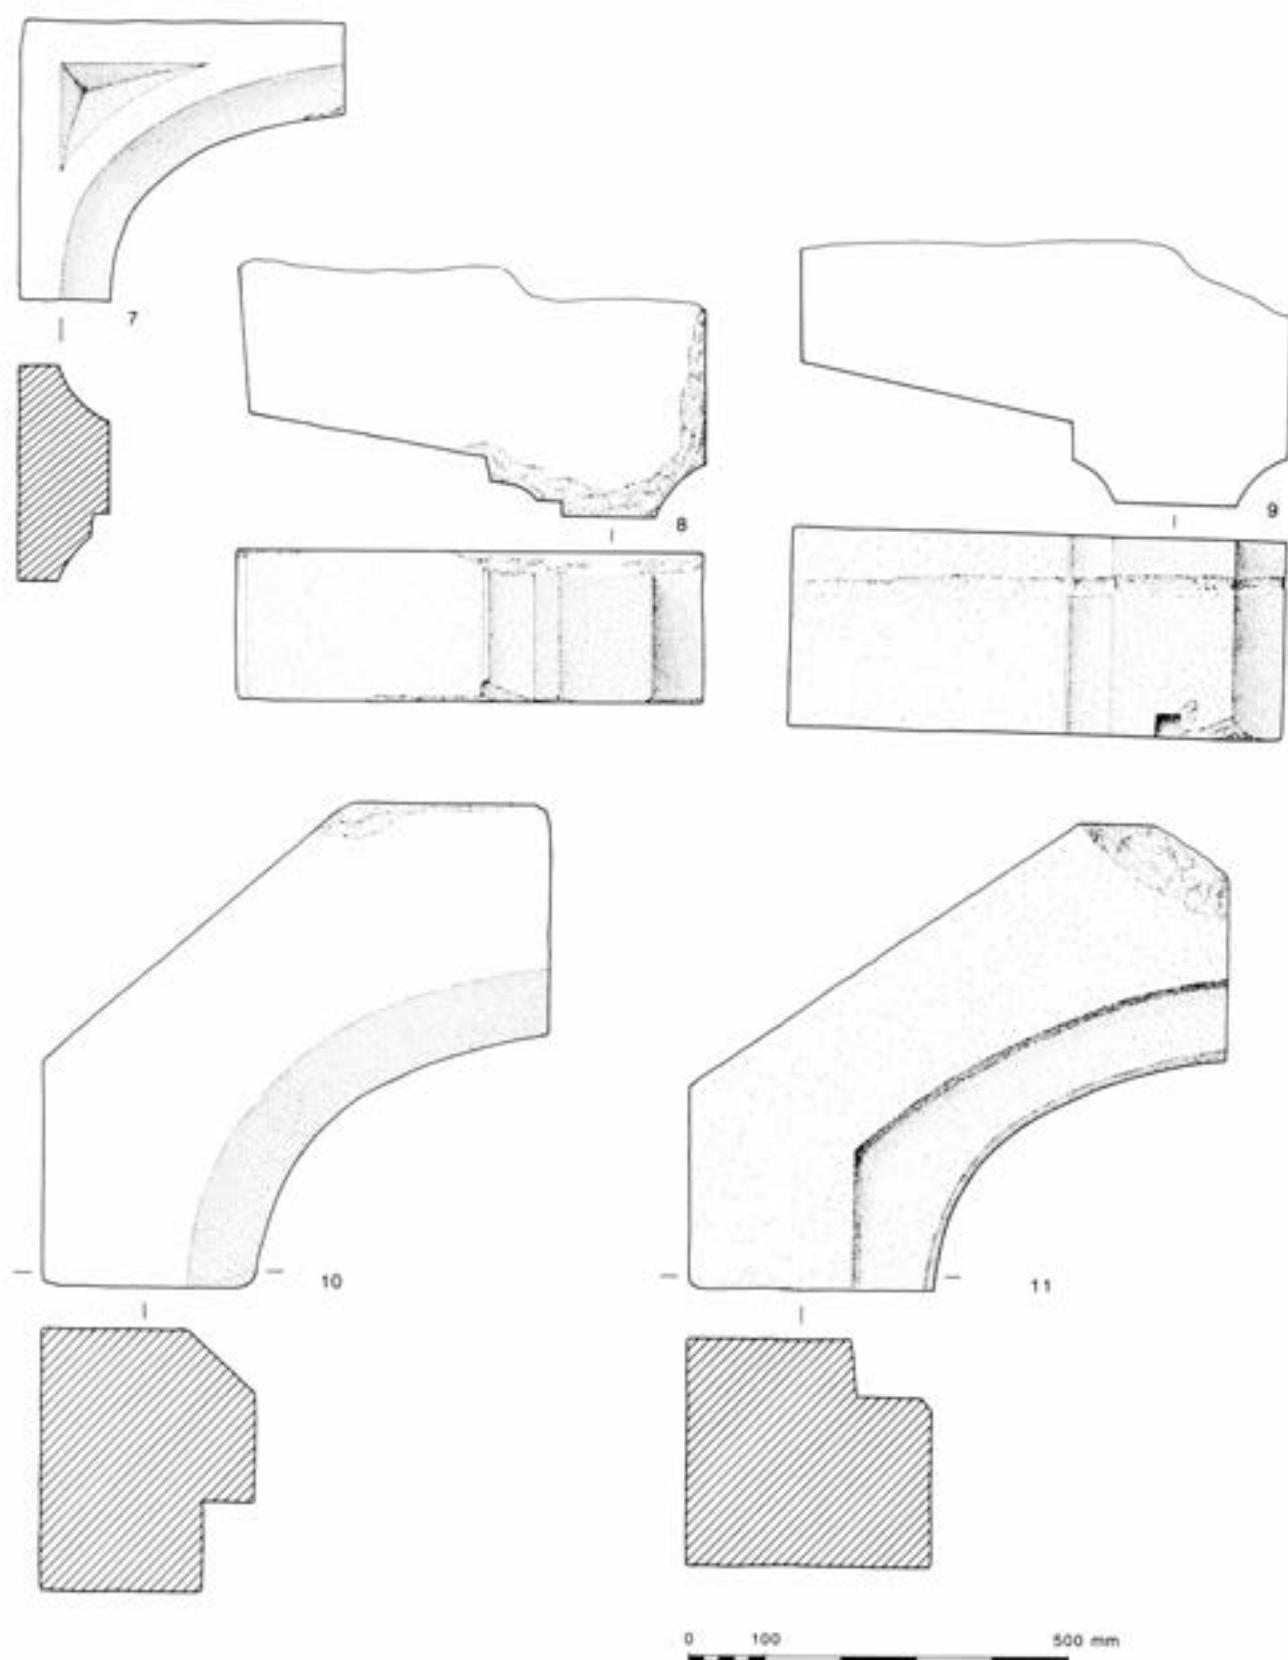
Architectural stone, Nos 7-11 (scale 1:10)
